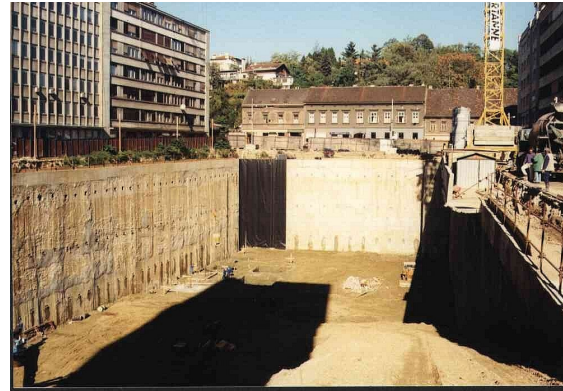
Completed deep excavation in Zagreb (Szavits-Nossan et al. 1999).
